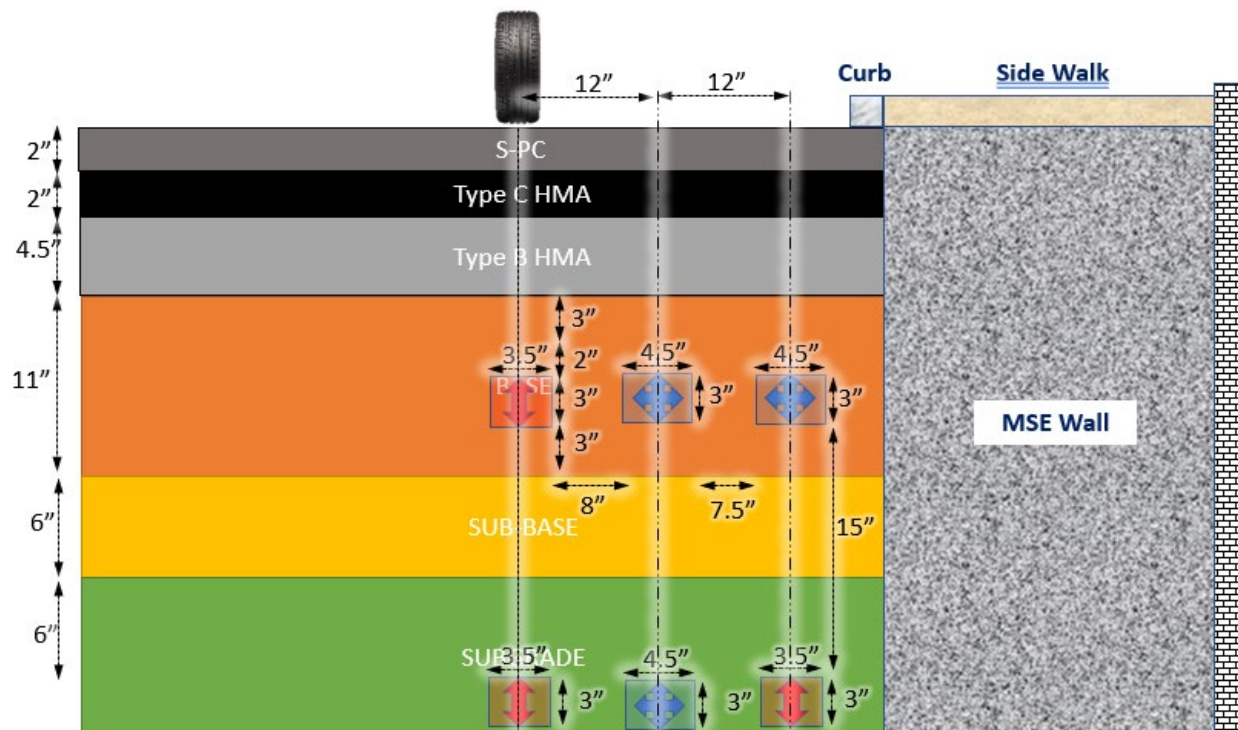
Cross section view at location central (0) in sections 1b, 2, 3 & 4
